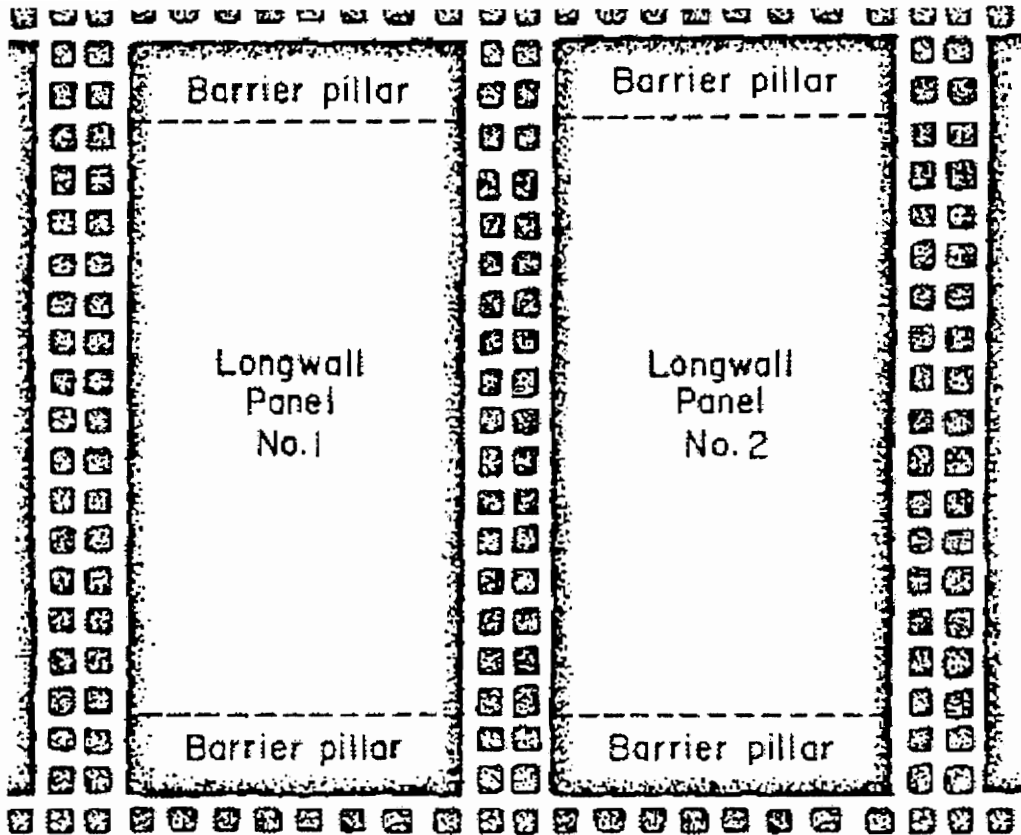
Barrier pillars left at the ends of an extracted longwall panel to protect the bleeder entries on one end and the main entries at the other end (after Mark, 1987).
